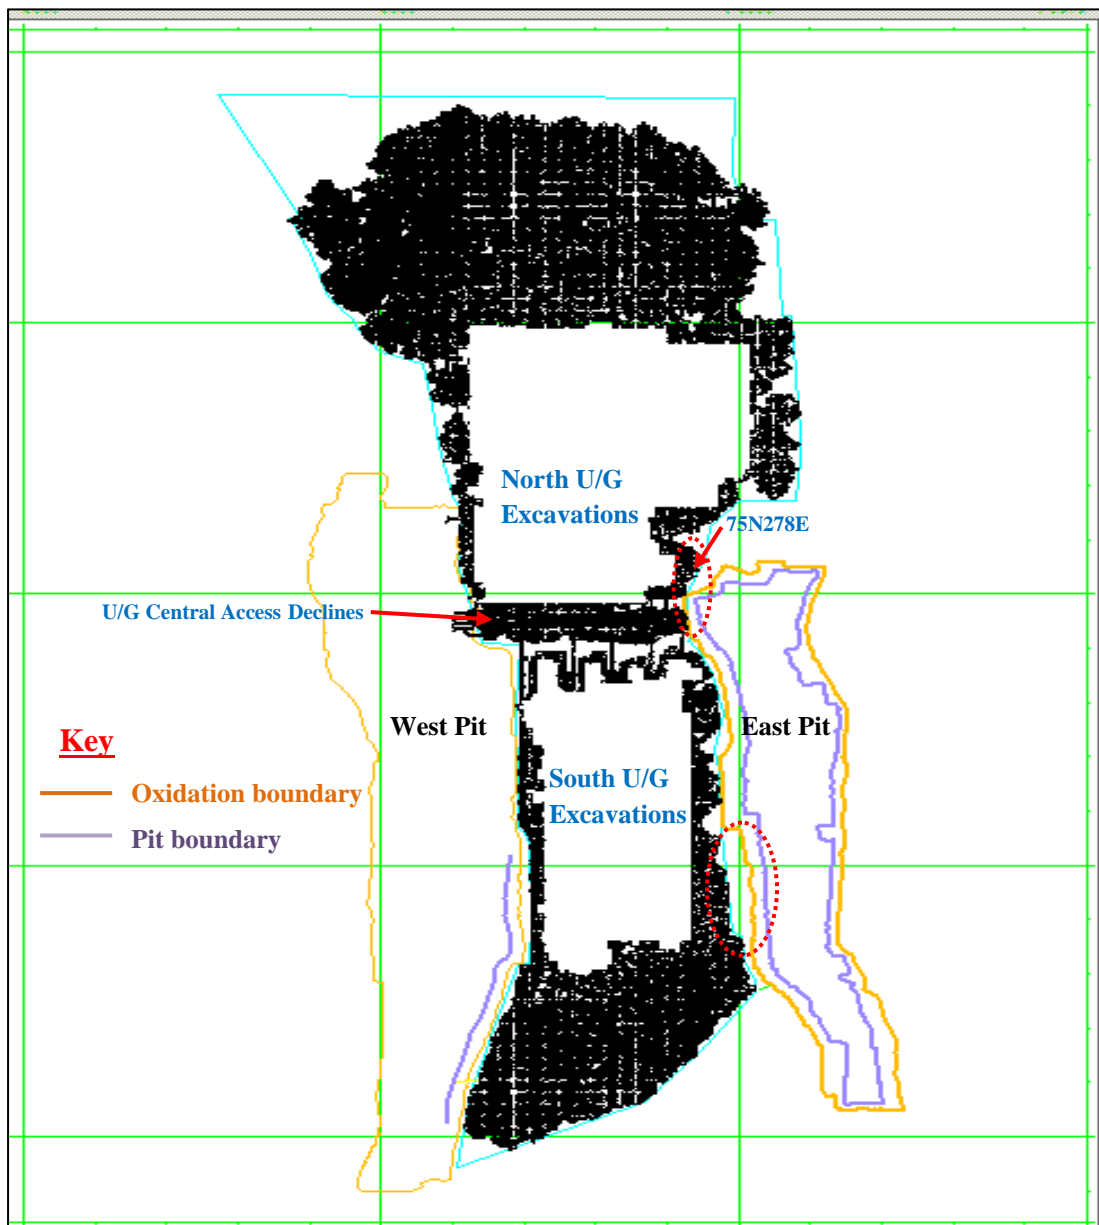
Plan of underground and open pit interactions at Rukodzi Mine
